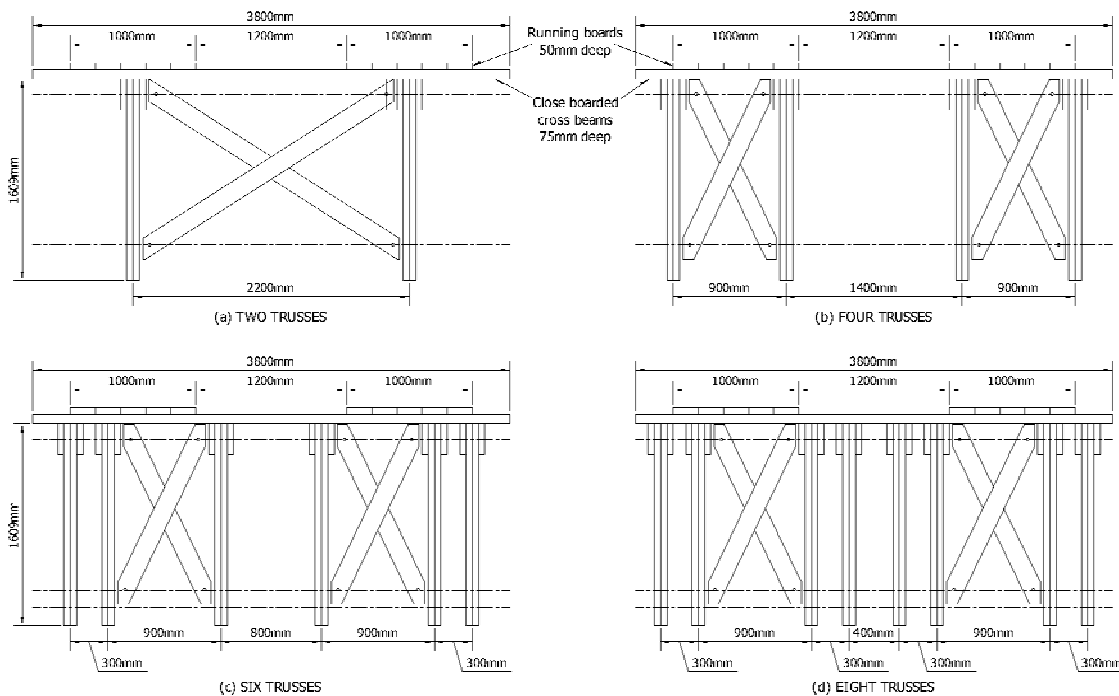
Cross-section of Kenyan Low-Cost Modular Bridge with 2, 4, 6, or 8 trusses (Reproduced from Parry 1981)
